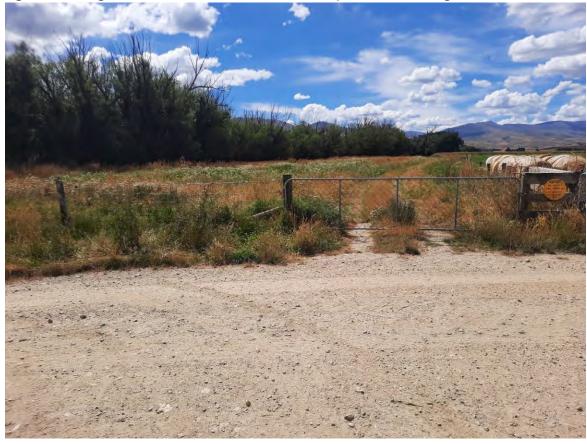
Existing entrance for Lots 2 and 4 on Mawhinney Road (photo taken looking north).
